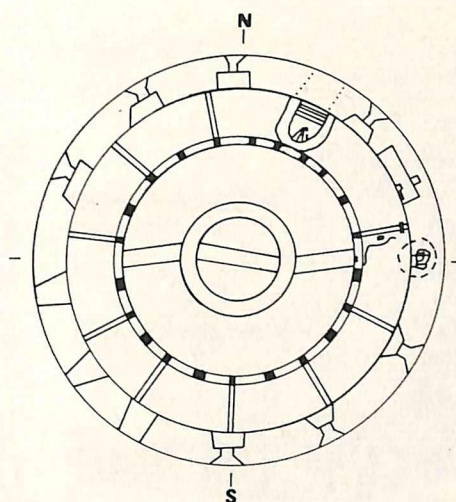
Top view of the stairwell built within the wall of the third circular structure.
